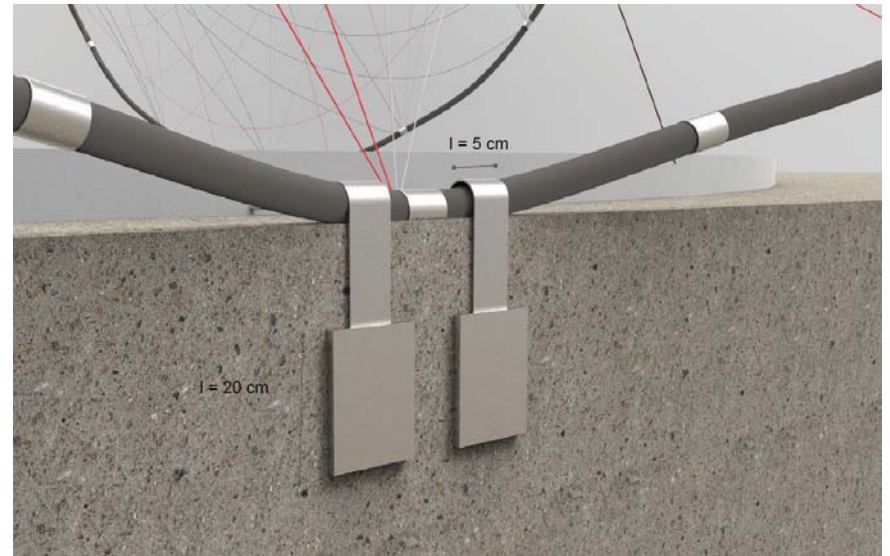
\_8: Architectural drawing.Floor fixation. (Source: Jingcheng Chen, Olga Kalina )
